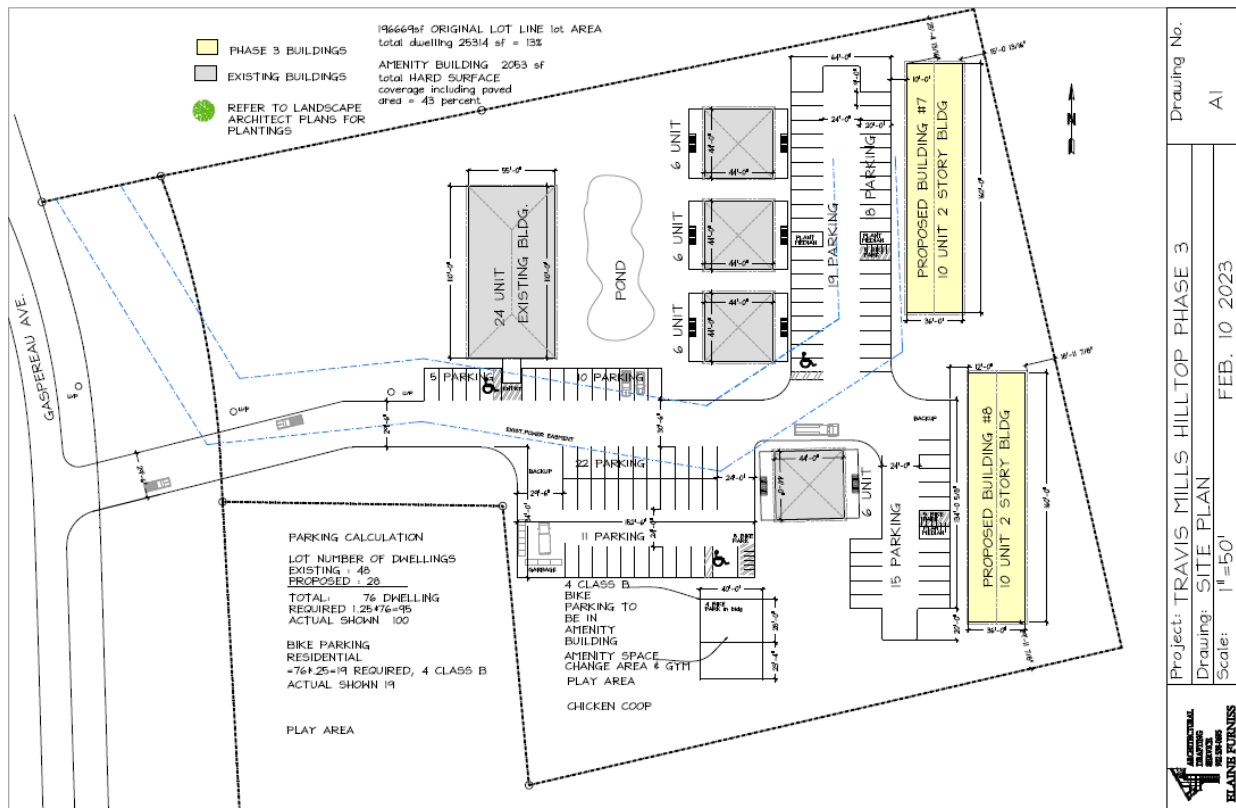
Updated site plan with two 10-unit 2-storey buildings.
